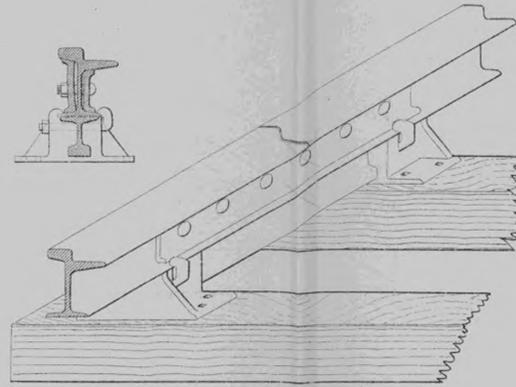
<sup>bis</sup> Joint Chair For Box Girder
